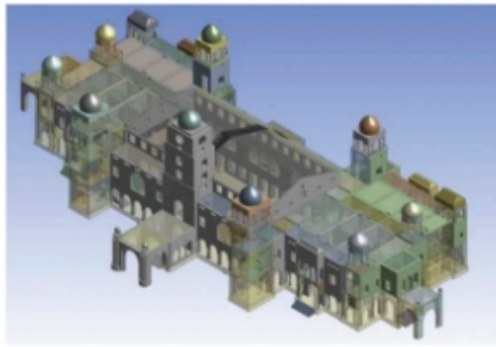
3-D digital model of unreinforced masonry senate hall building
